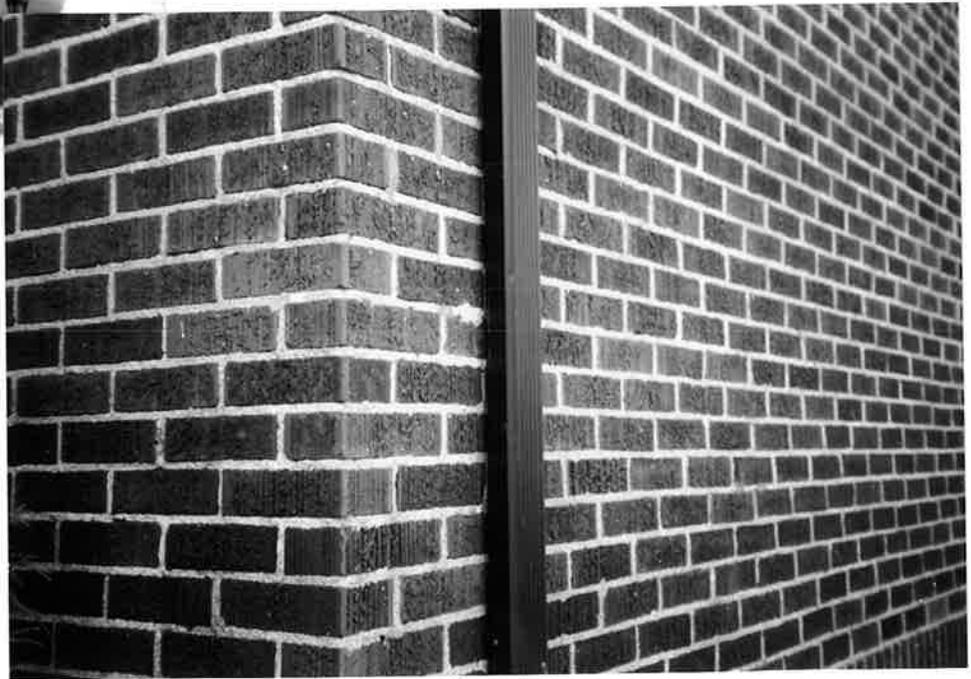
East elevation, northeast corner, and north elevation of house 2004.
